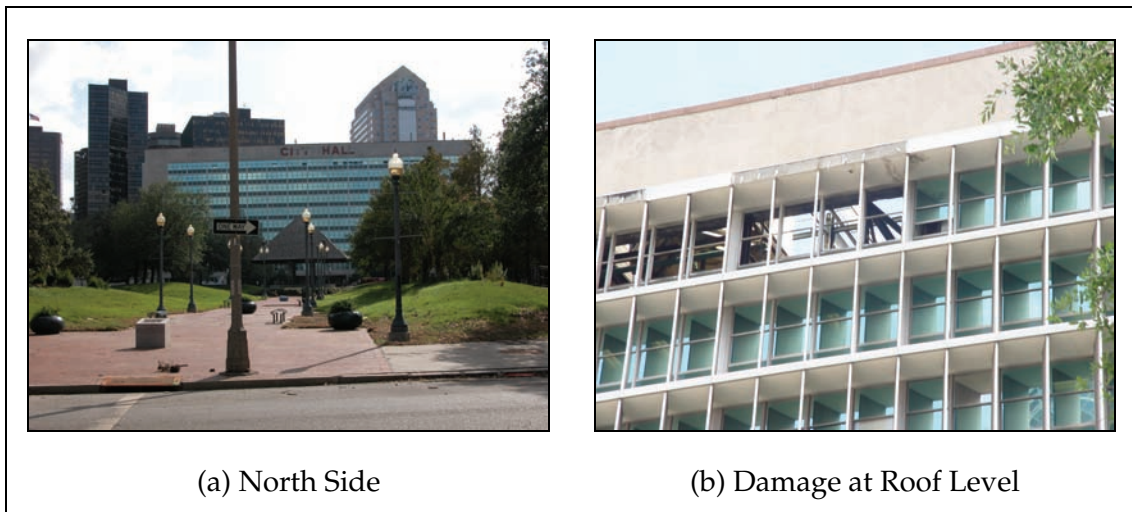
New Orleans City Hall suffered damage mainly at the roof level.
